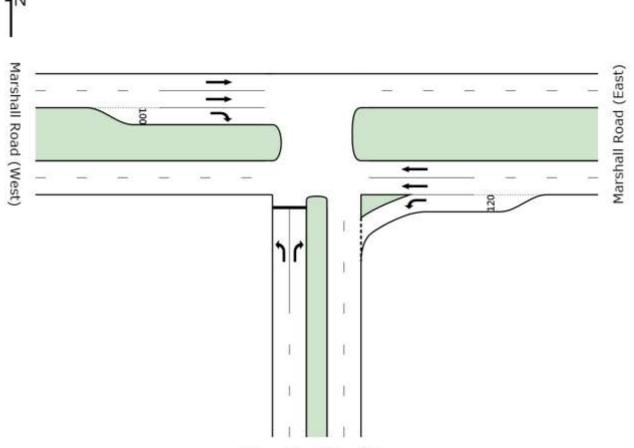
Proposed Priority Intersection Layout of Marshall Road and Altone Road
